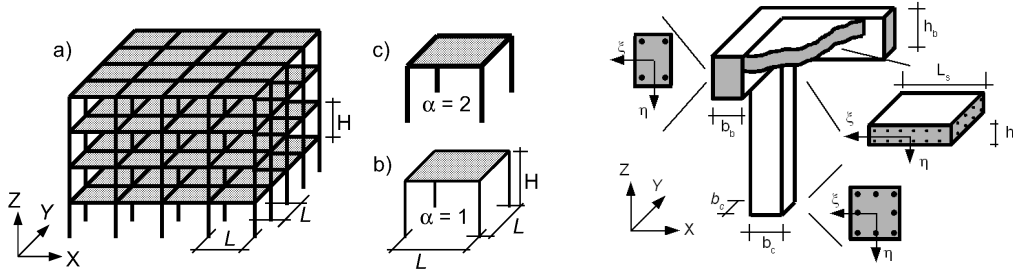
The studied frame structure and elementary cells with b) $\alpha=1$ and c) $\alpha=2$. and cross sections of structural elements and disposition of the reinforcement. Subscripts c , b and s used for column, beam and slab.
